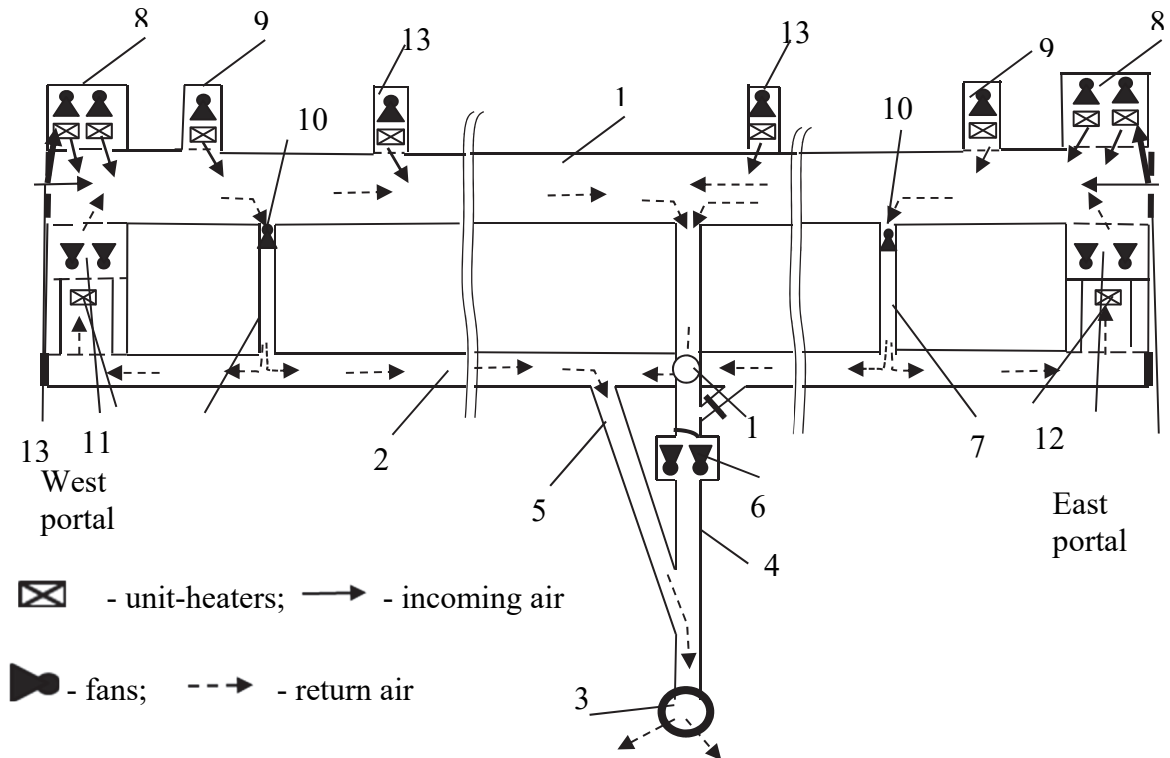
Ventilation scheme for Severomujsky tunnel in winter: 1 – traffic tunnel (TT); 2 – service tunnel (ST); 3 – Ventilation shaft (VSh); 4 – crossing (Cr); 5 – bypass tunnel (BT); 6 – ventilation room with main fans (VR); 7 - ventilation crosscut (VCrc); 8 – ventilation building (VB); 9 – additional unit-heaters (AH); 10 – fans for air-splitting (Fsp); 11 – fans for recirculation air (Frec); 12 - unit-heaters for recirculation air (UHrec); 13 – local unit-heaters (LH); 14 - air staple shaft (Assh); 15 – automatic gates (AG).
